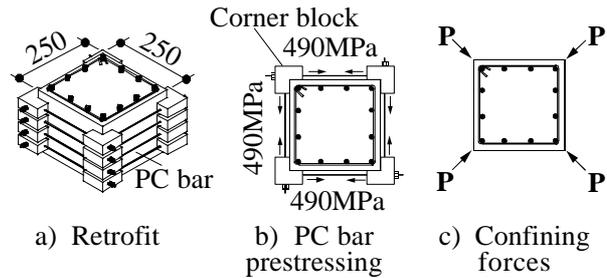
Detail of retrofit by PC bar prestressing and confining forces
